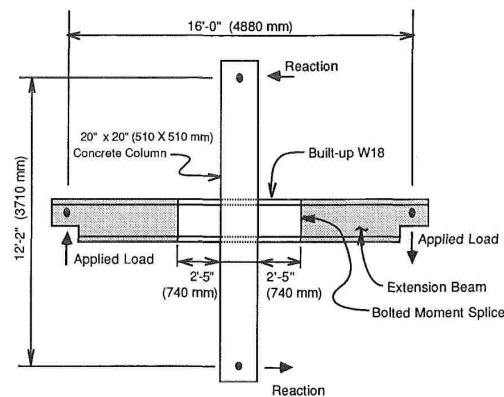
Typical Test Specimen (Sheikh, et al)
